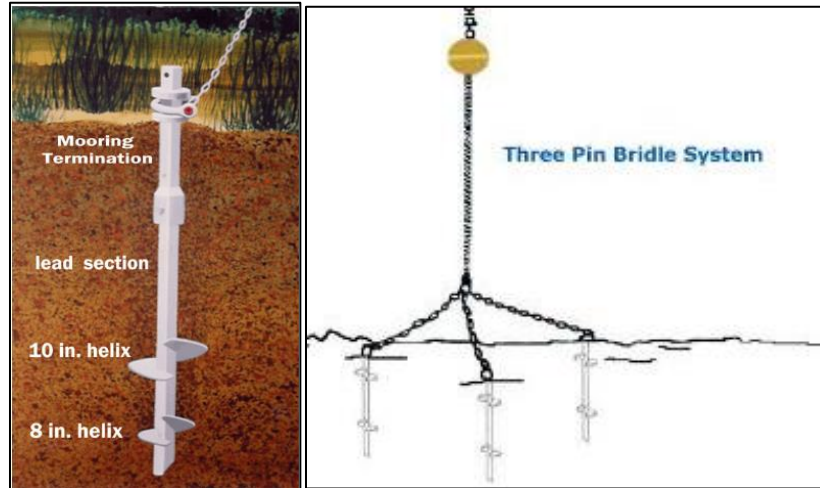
Helical Sand Screw (left – single, right – three pin bridle)
